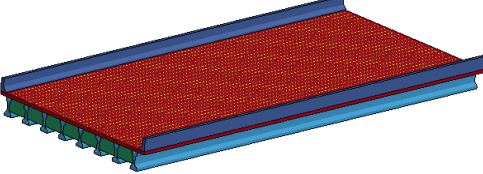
Cross-Sectional View of Archetype 4 Bridge Drawing
